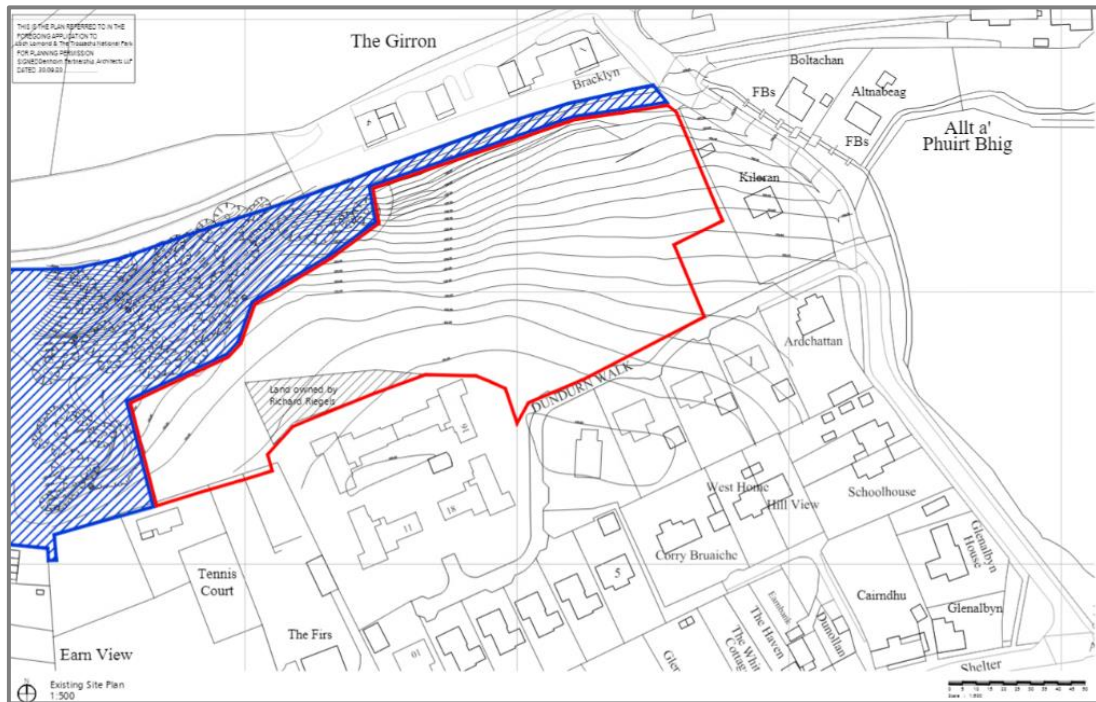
Extract of plan at 1:500 scale showing the location of the application site and topography (image not to scale).
